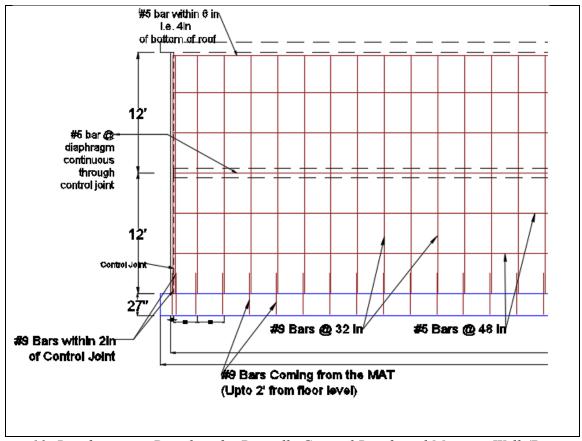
Reinforcement Detailing for Partially Grouted Reinforced Masonry Wall (Portion of the front view)
